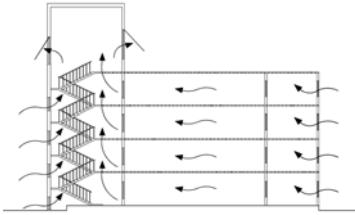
FIGURE VI. THERMAL PRESSURE VENTILATION BETWEEN STAIRS
